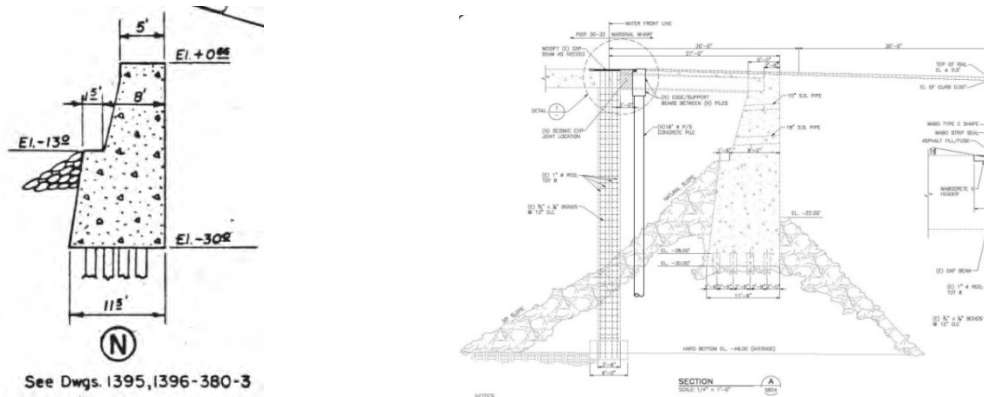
Seawall Section 10, Bulkhead Wall Type N
